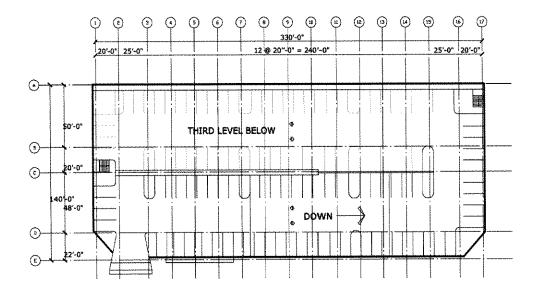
Lake Natoma Inn Parking Structure Floor Plans (Total Parking Spaces = 332, Ref. Carlton engineering, Inc)
